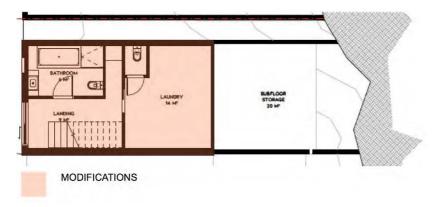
Lower ground floor showing major modifications (undertaken in 1981).
